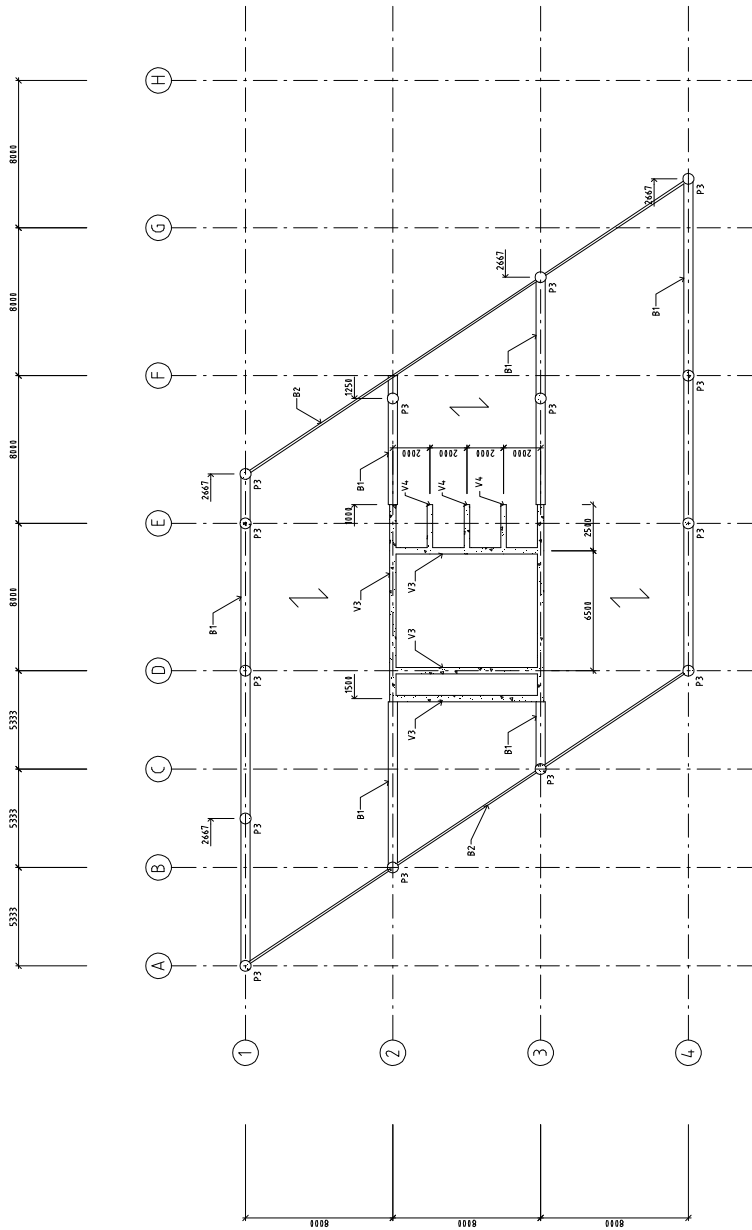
Floor plan of storey F23 to ROOF in Figure A.3 and A.4, see Table A.1 for explanations.
